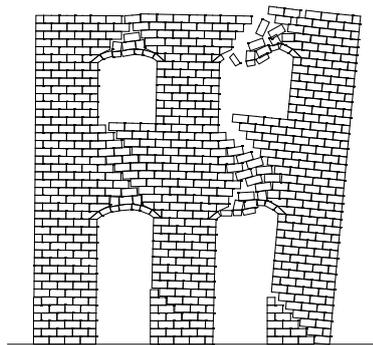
Pattern of cracks during failure for the Standard masonry wall 1
